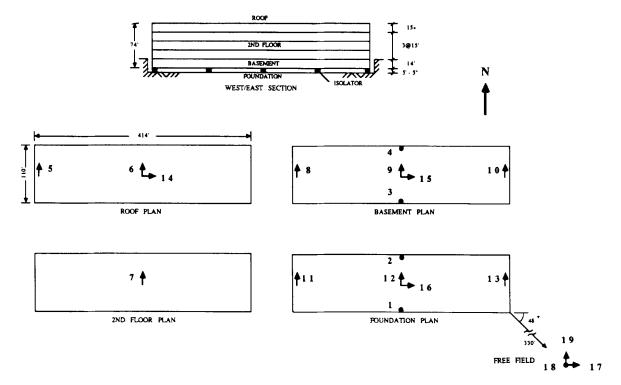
Sensor layout in the Rancho Cucamonga Law and Justice building. Arrows show the location and positive direction of the accelerometers. Dots indicate positive direction out of the plane of the figure (from Huang et al.<sup>3</sup>)
